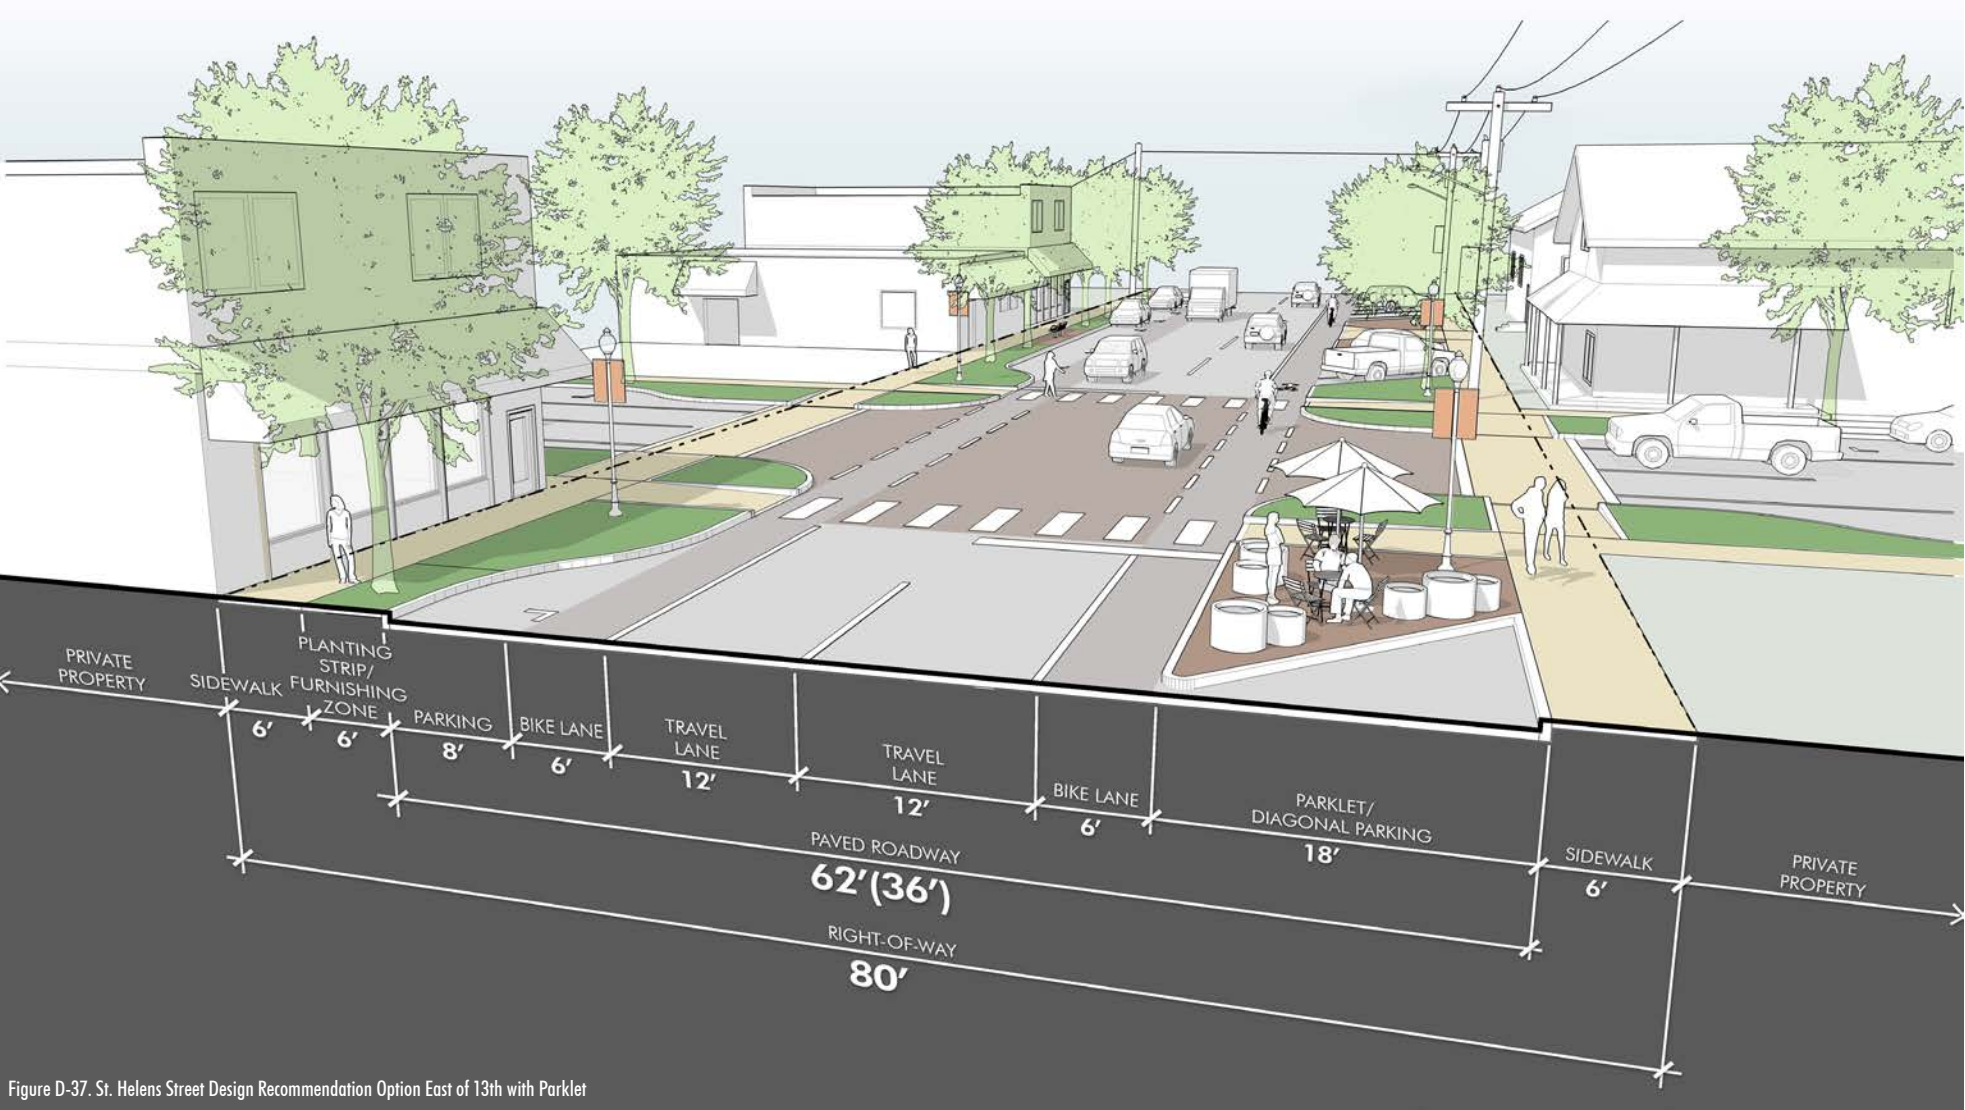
St. Helens Street Design Recommendation Option East of 13th with Parklet
